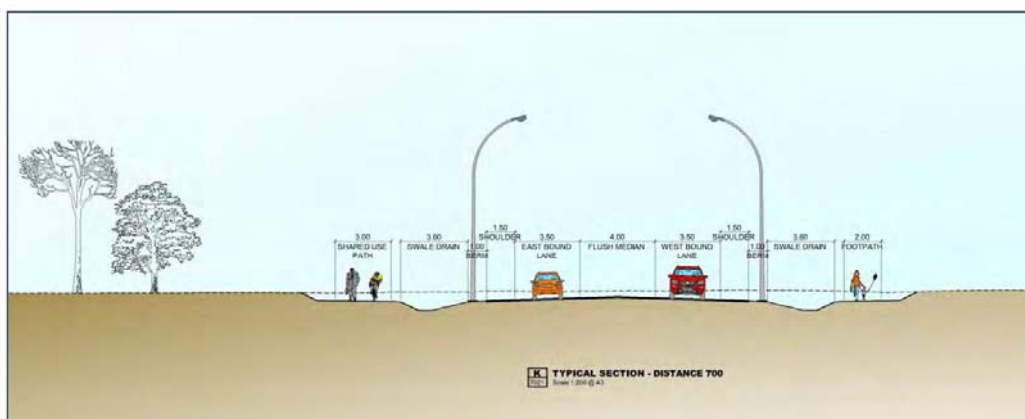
Typical cross section – East-West arterial roads and urban upgrade of Peacocke Road
